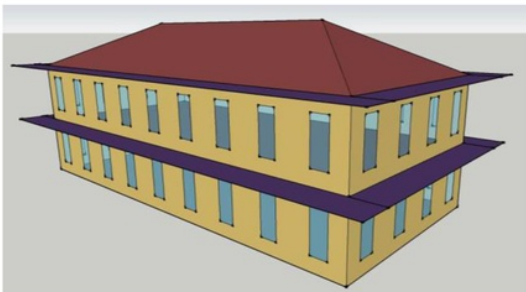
Colonial Office model with width of 1.80m sun shading and wall openings of 20%.
